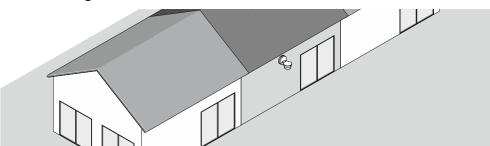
Wall mounting on centre-row house 6851/9-xxx
